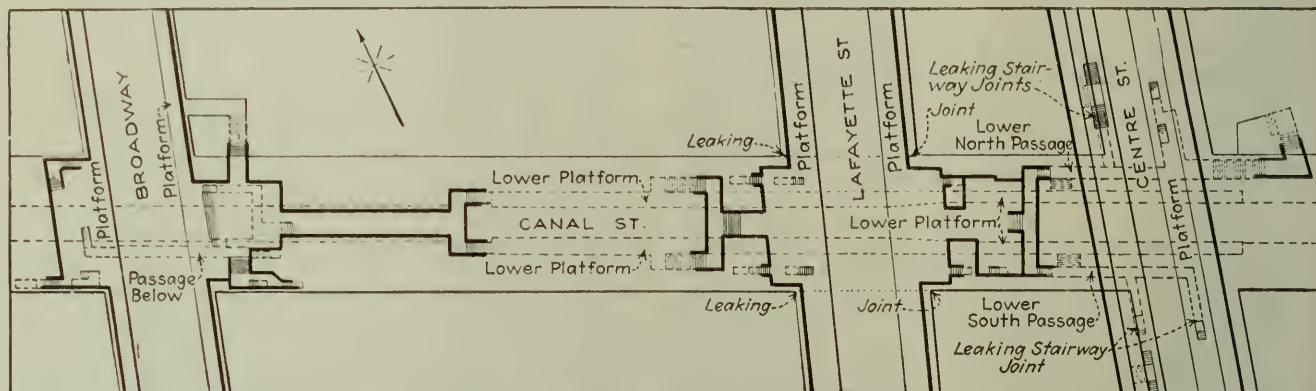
GENERAL PLAN OF FOUR-UNIT SUBWAY STATION AT CANAL ST., NEW YORK CITY (BROADWAY TO LAFAYETTE ST.)
